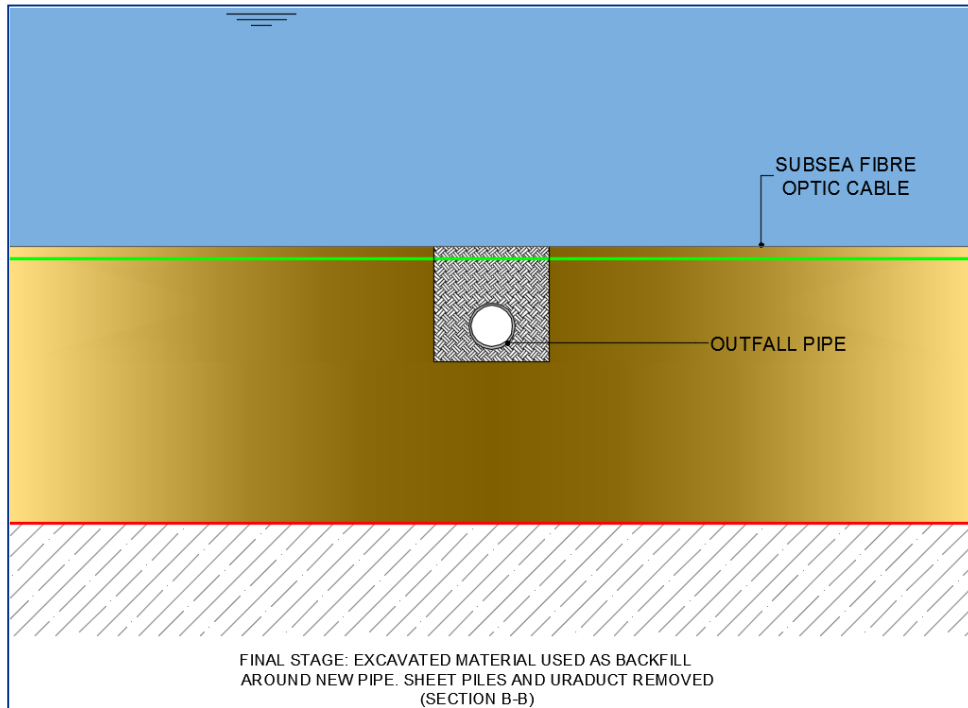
Fibre Optic Cable Crossing – Stage 3 – Backfill Trench
